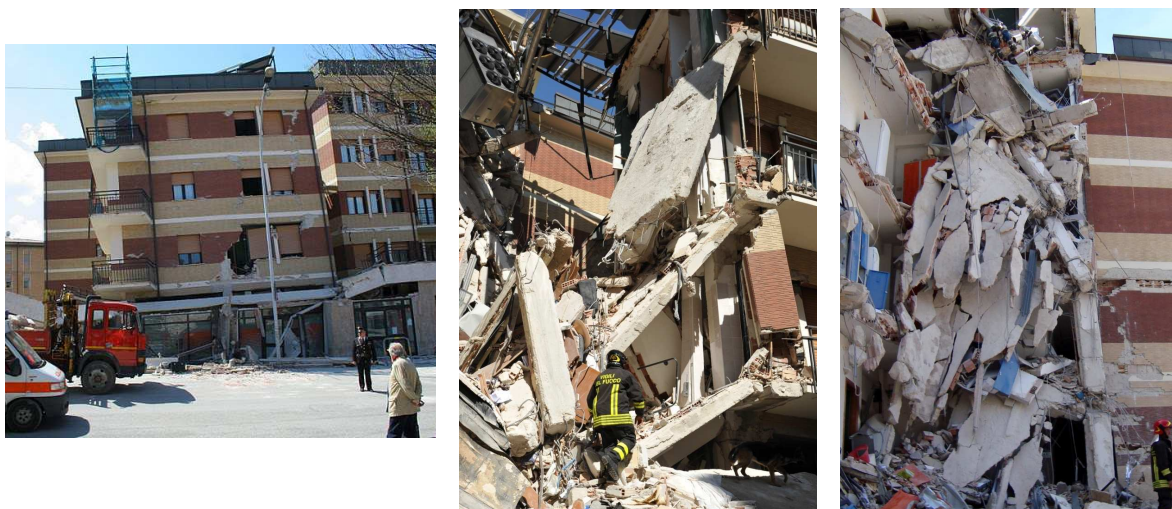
The partial collapse of the building. Left, the soft story of North wing, view from XX September Street. Center, the collapse of the columns at the interface between the North wing and the remaining wings. Right, the remaining of column 29 after demolition of the collapsed region
